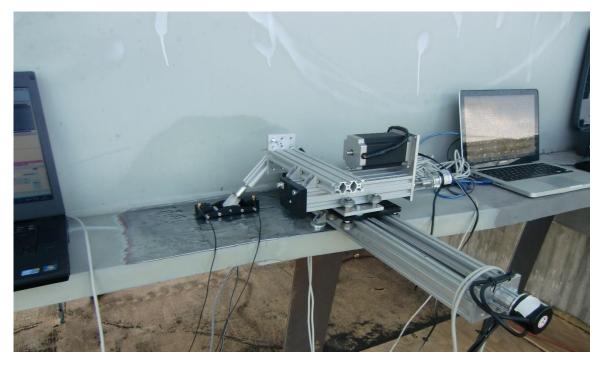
Examining butt-welds in the lower flanges with UT-TOFD. The top side weld region has been grinded flat and blasted (similar to other parts of the bridge where new stiffeners should be welded) to enable a clean and smooth surface to run the transducer on.
